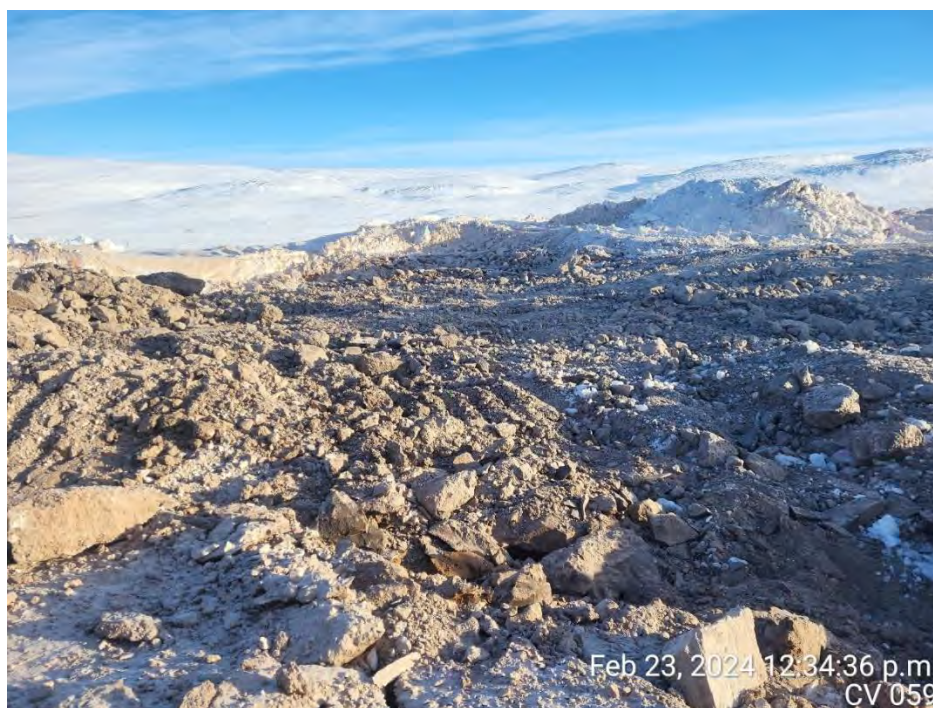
CV-059 looking east at the blasting excavation in the area of the culvert (February 23, 2024)
